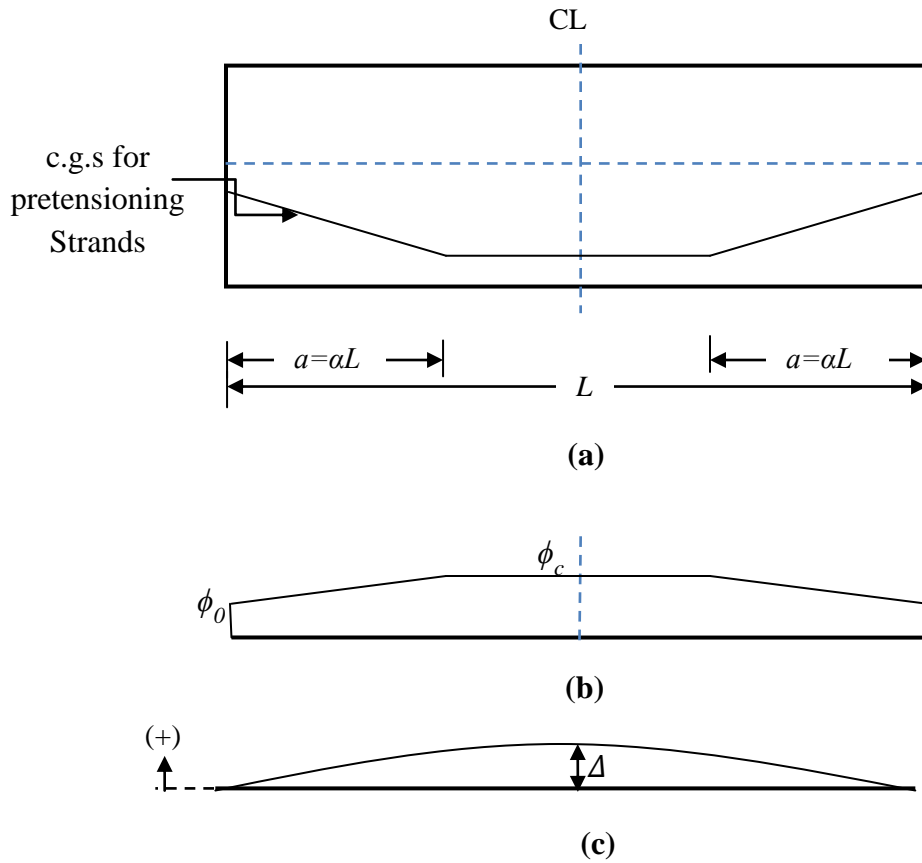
(a) Prestressed beam pretensioning strand profile,(b) curvature, and (c) elastic curve for singly supported bridge girder with double
